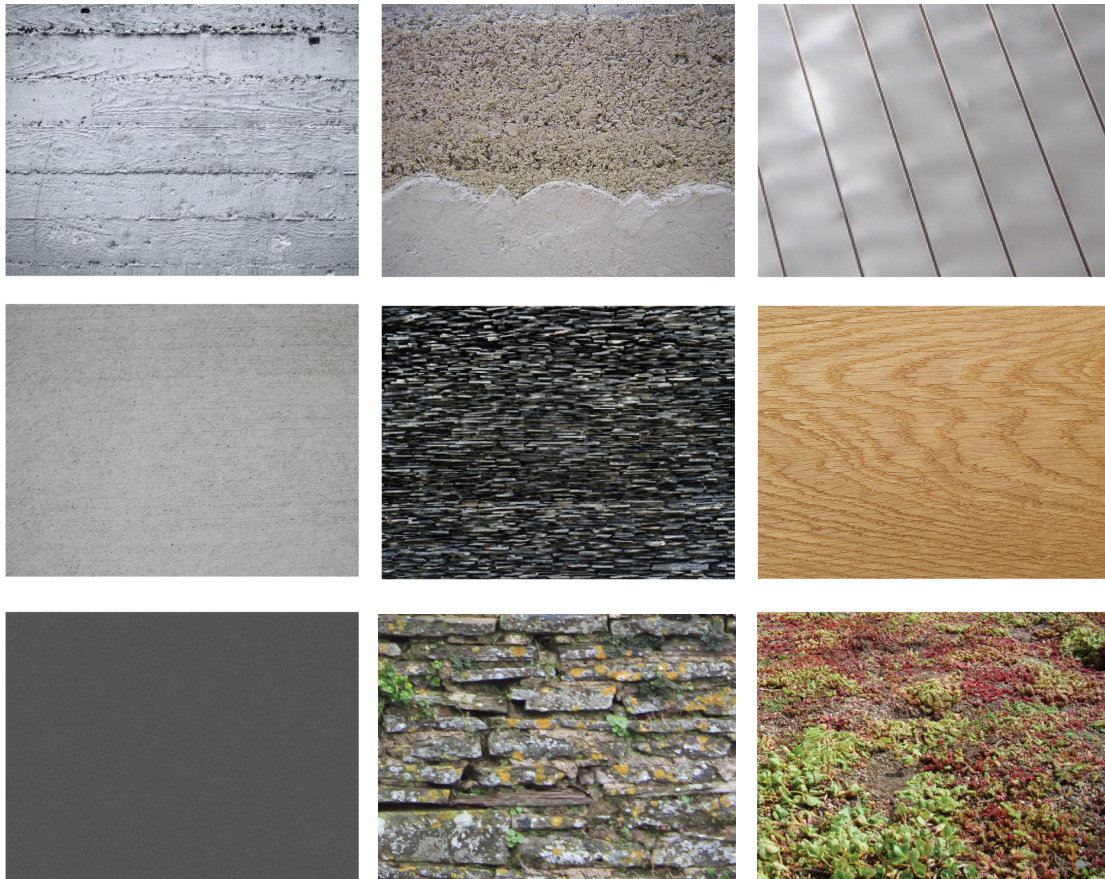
Materials specified for the design (from left down, centre down, right down) In situ board marked concrete; Smooth finish in situ concrete; Dark grey lime render; Hemcrete; local stone; Slate; Aluminium standing seam roof; Timber; Sedum roof
